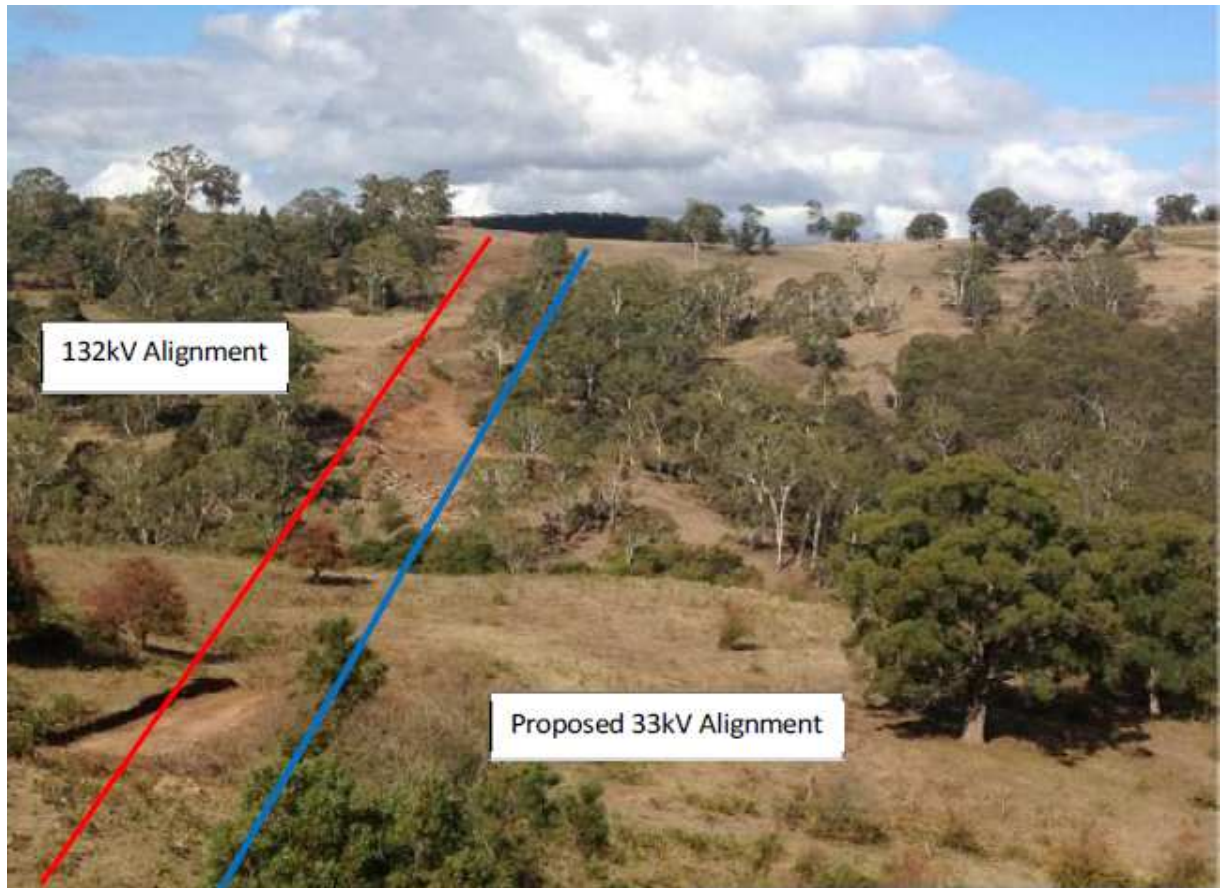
Existing 132kV Essential Energy alignment and proposed 33kV alignment looking east across the Charteris Creek gully
